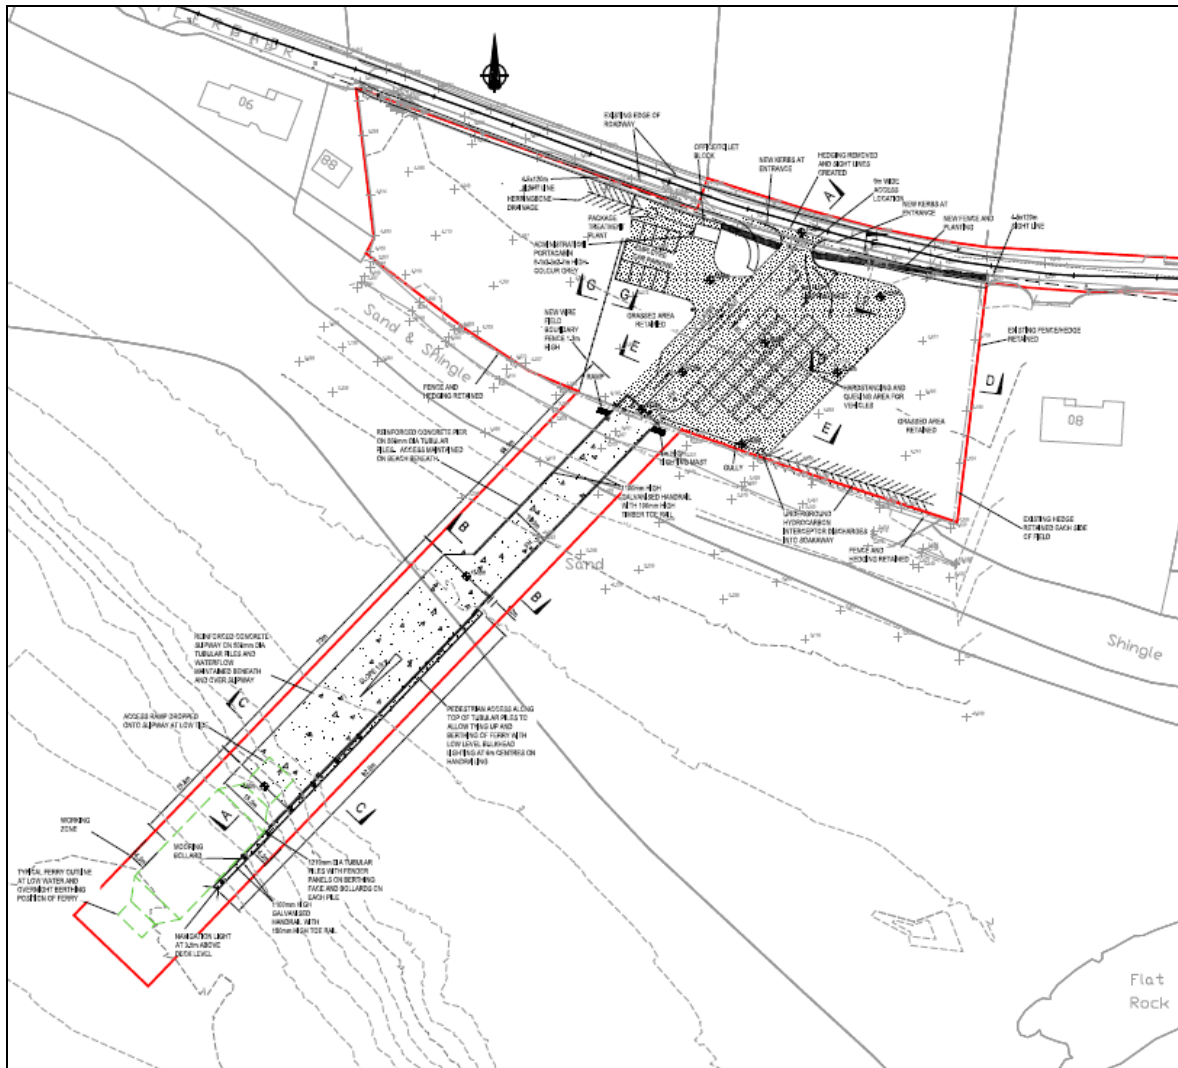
Plan of Proposed Development at Greencastle, Co. Down
